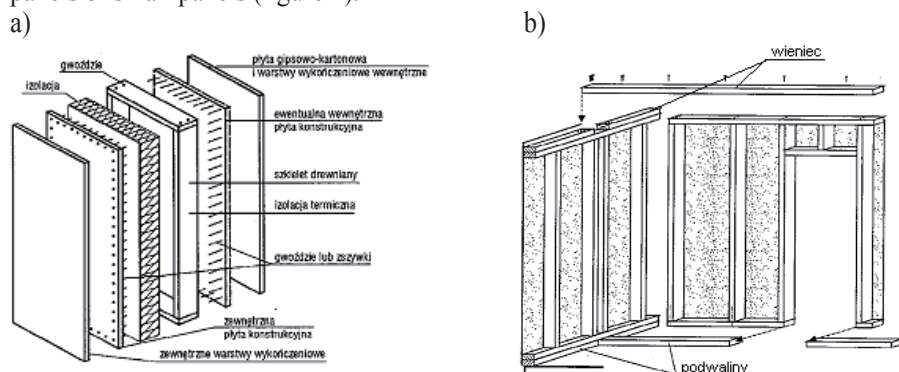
Wall diaphragms (panel) construction in plate buildings construction: a) structure of the single unit wall plate, b) joining of the neighboring walls using timber tie.
